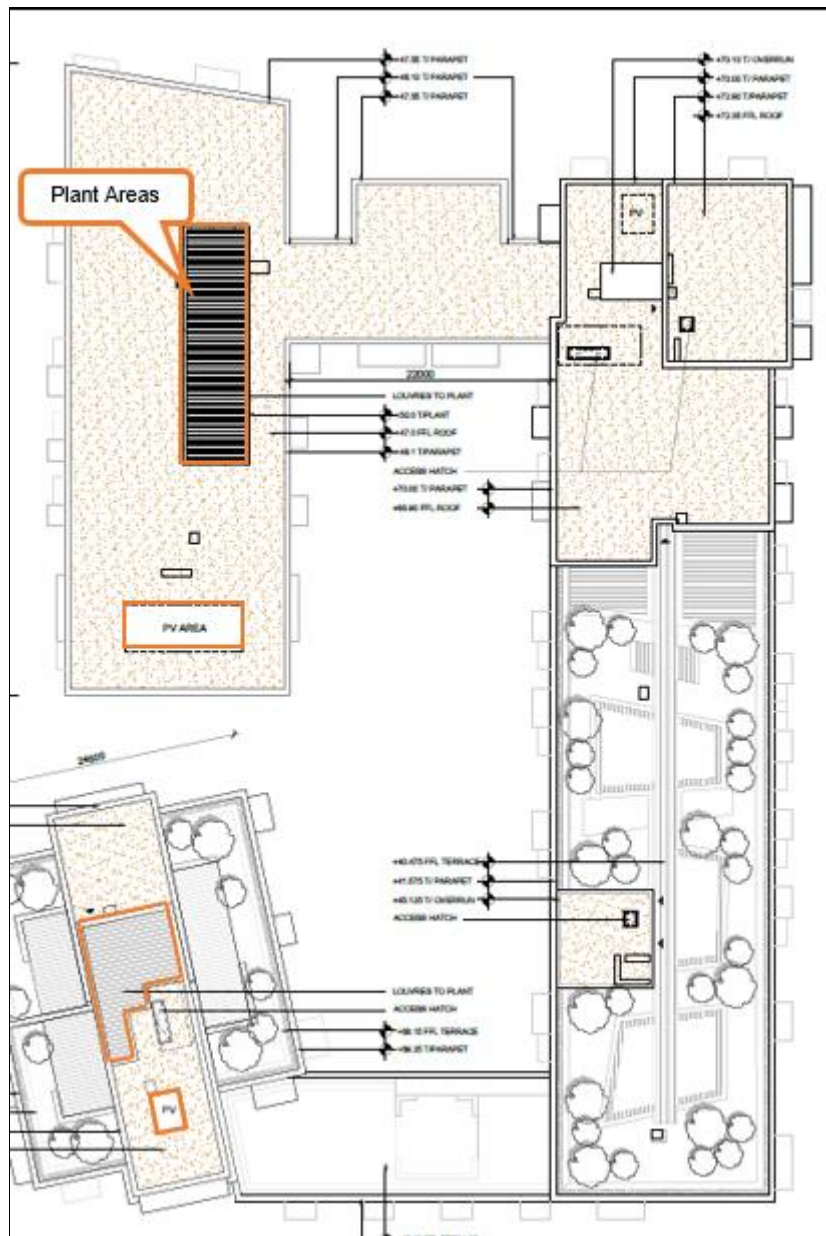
PLANT AREA AT ROOF LEVELS ON BUILDING PW2
